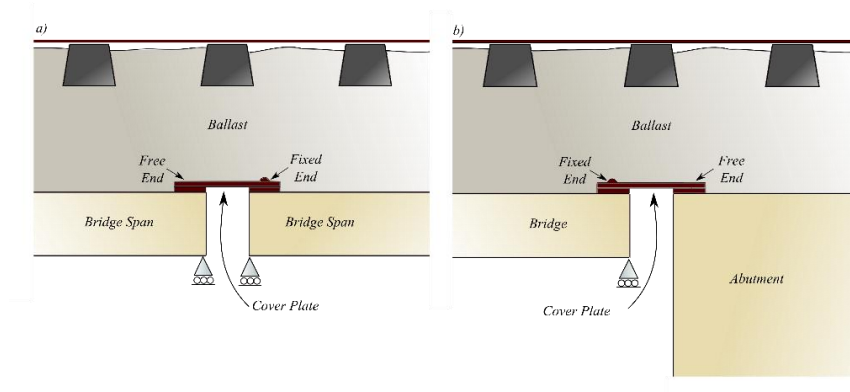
Simple spanning plate supporting continuous ballast, structural joint detail used on HS1 (a) between two adjacent bridge decks, (b) between a bridge deck and an abutment.
